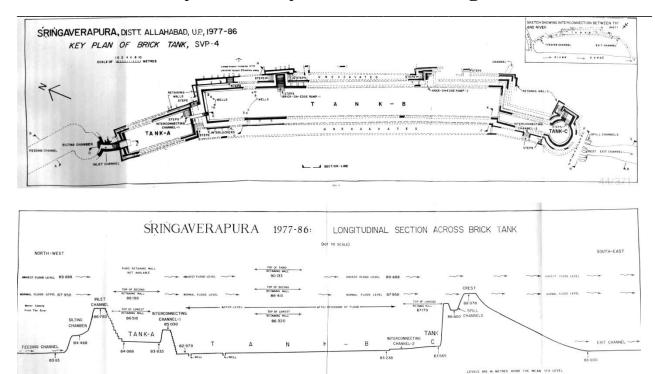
Complete Plan of Brick Tank and Its Longitudinal Section (Lal, 1993).<sup>22</sup>
